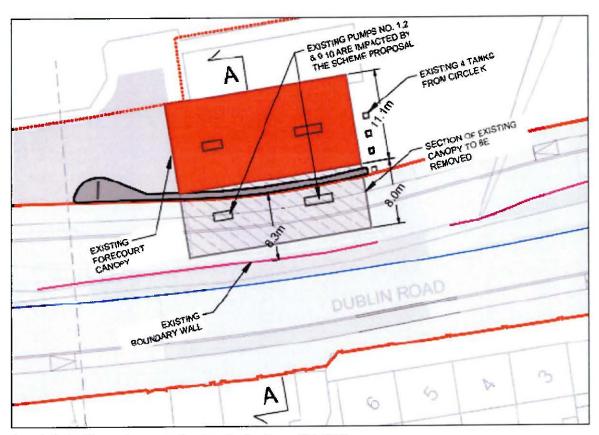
Revised forecourt arrangement post construction (Source: NTA, 2024)
